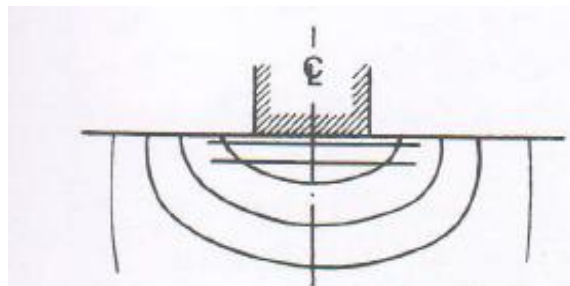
Ideal Pattern of Reinforcement Beneath Footing [14]
